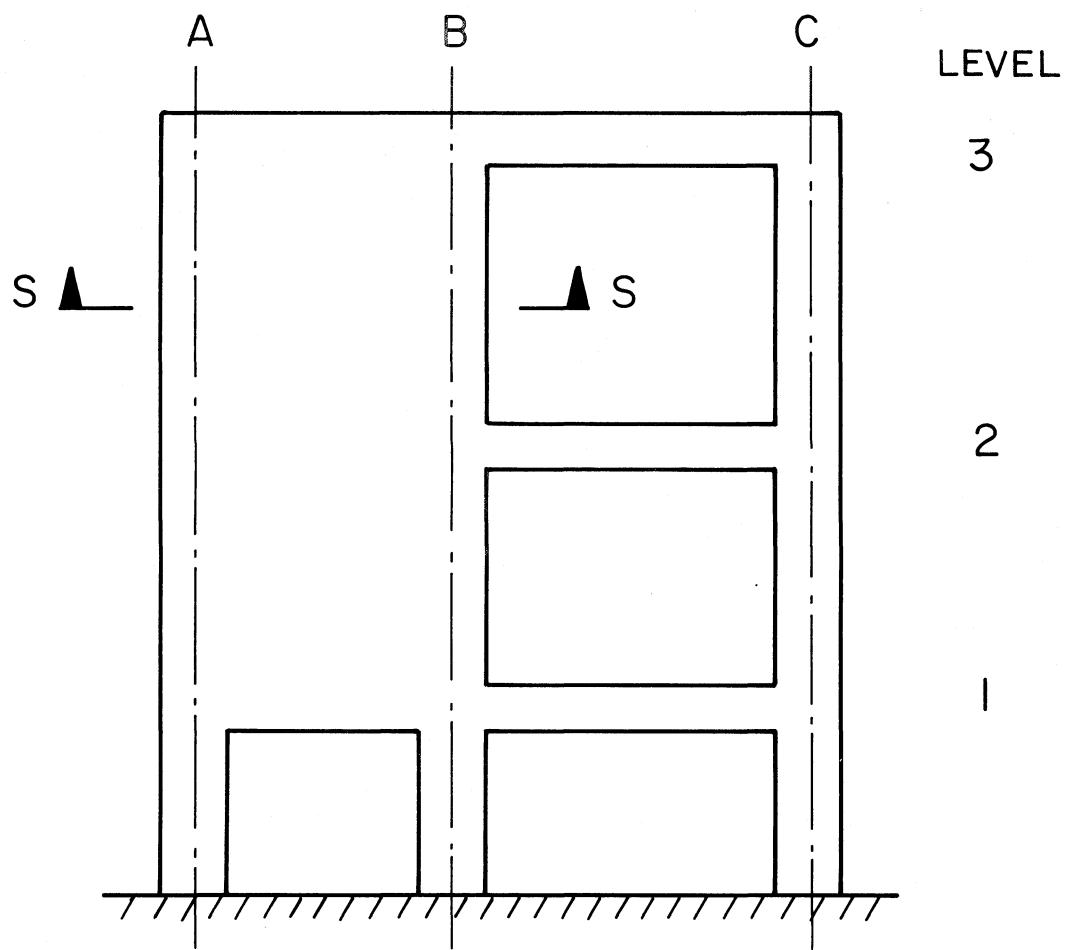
MODEL OF SHEAR WALL TERMINATED
